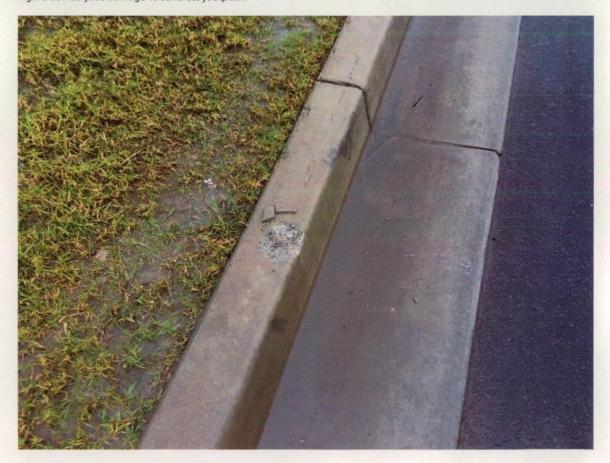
Damage to kerb, water retained in wheel ruts.
